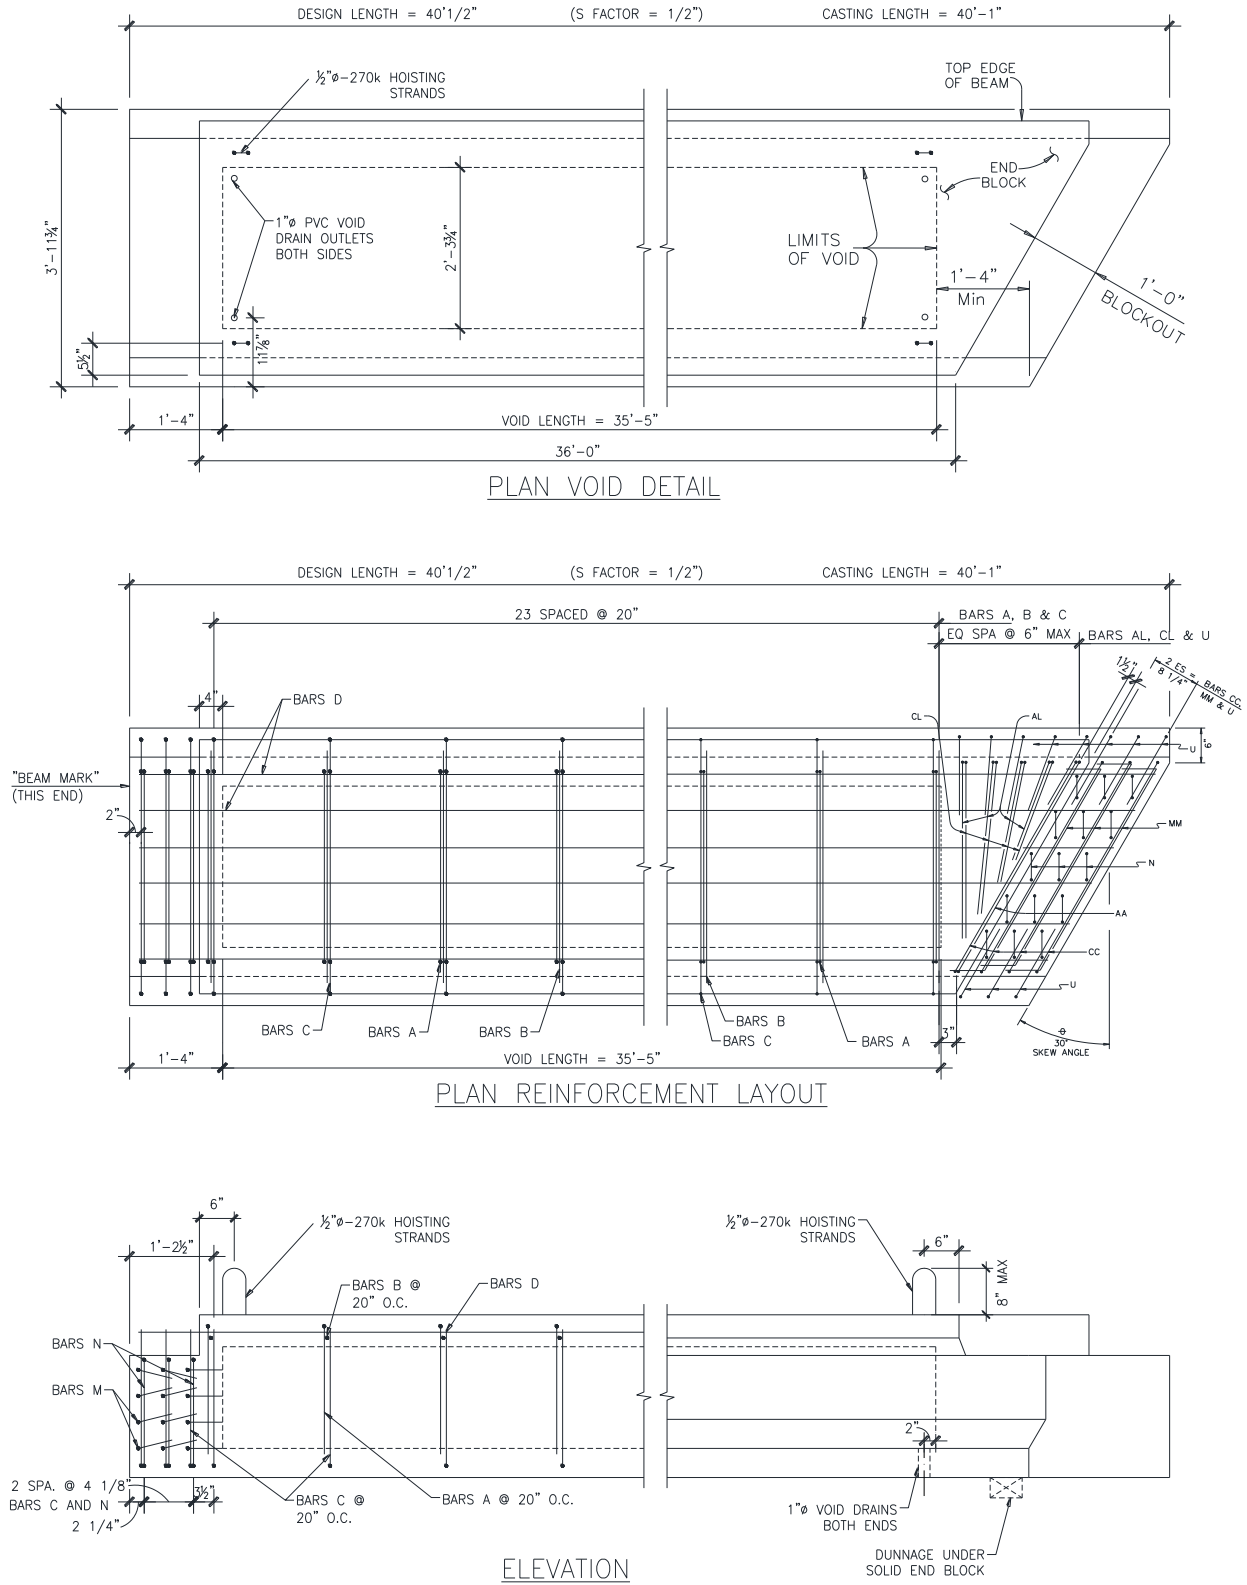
Plan and Elevations for 4B28 box beams: BB-02, BB-04, BB-07 and BB-09.
